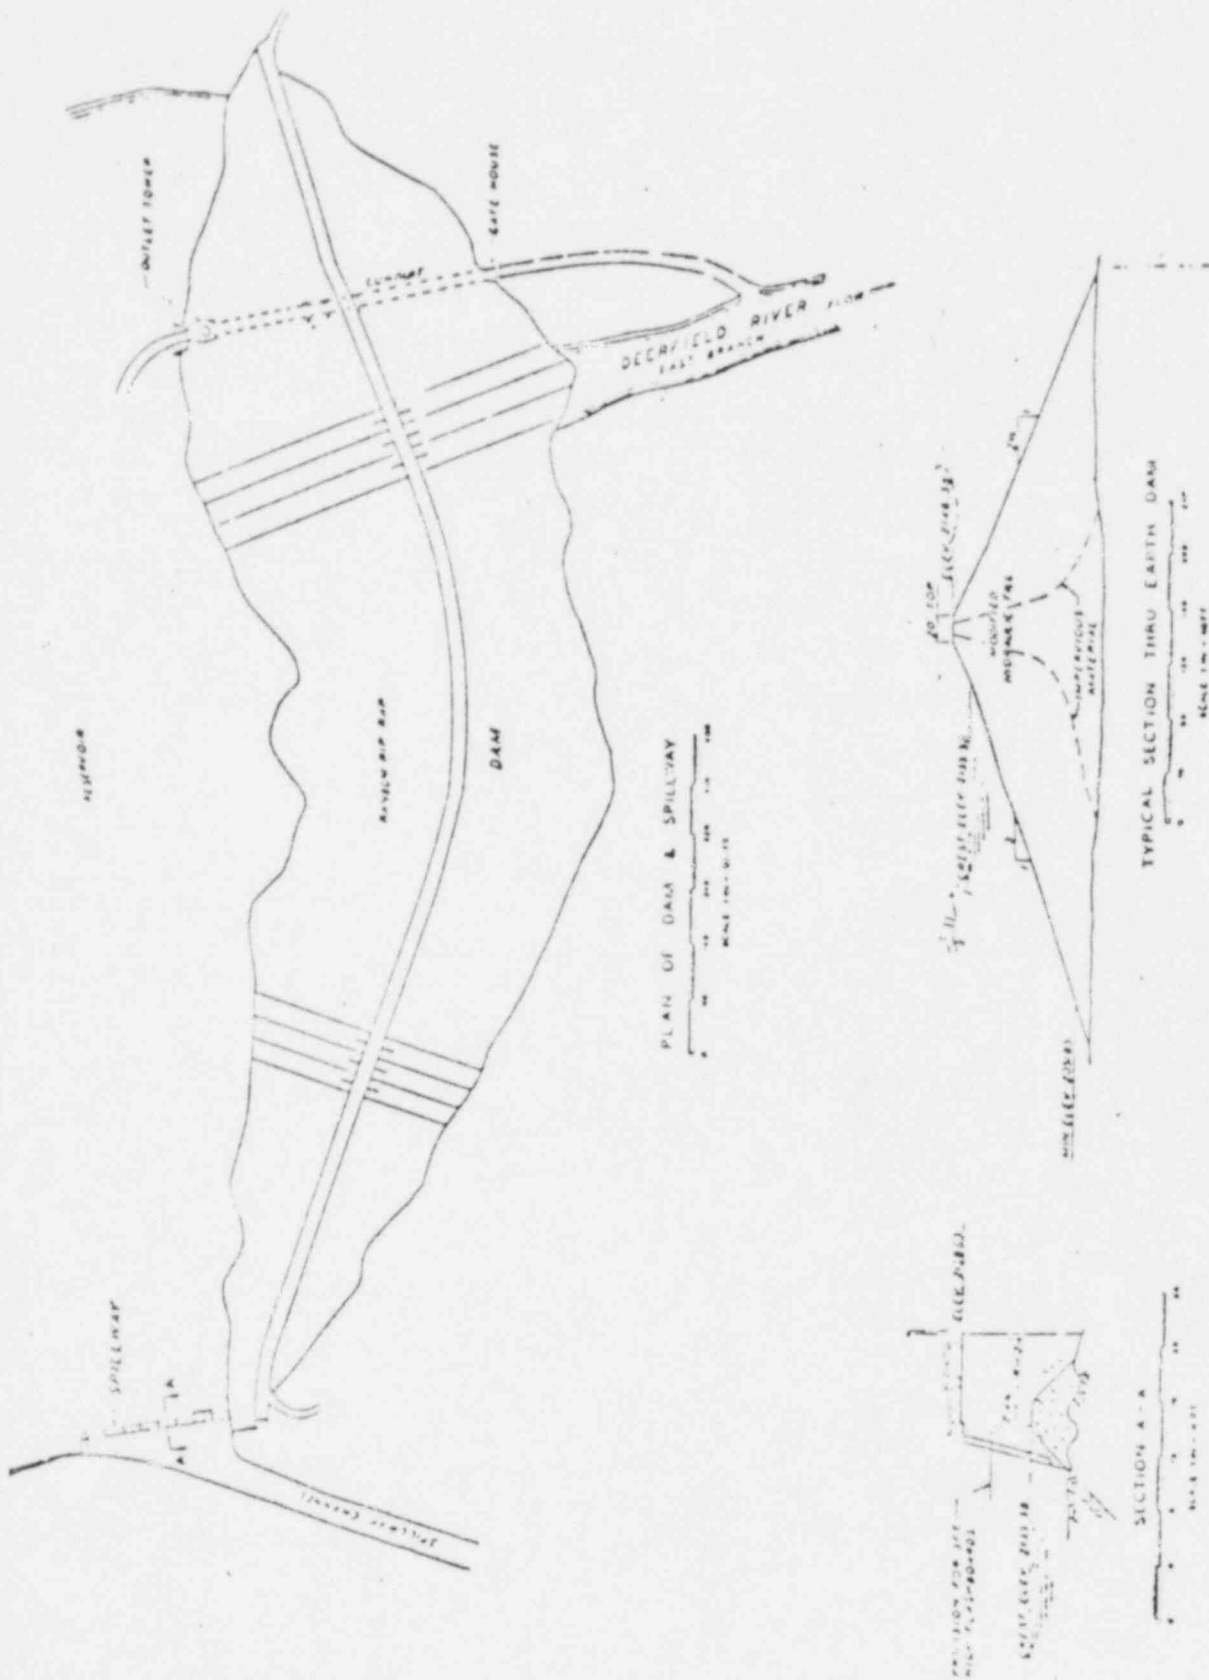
Somerset Dam and Spillway – Plan and Sections
